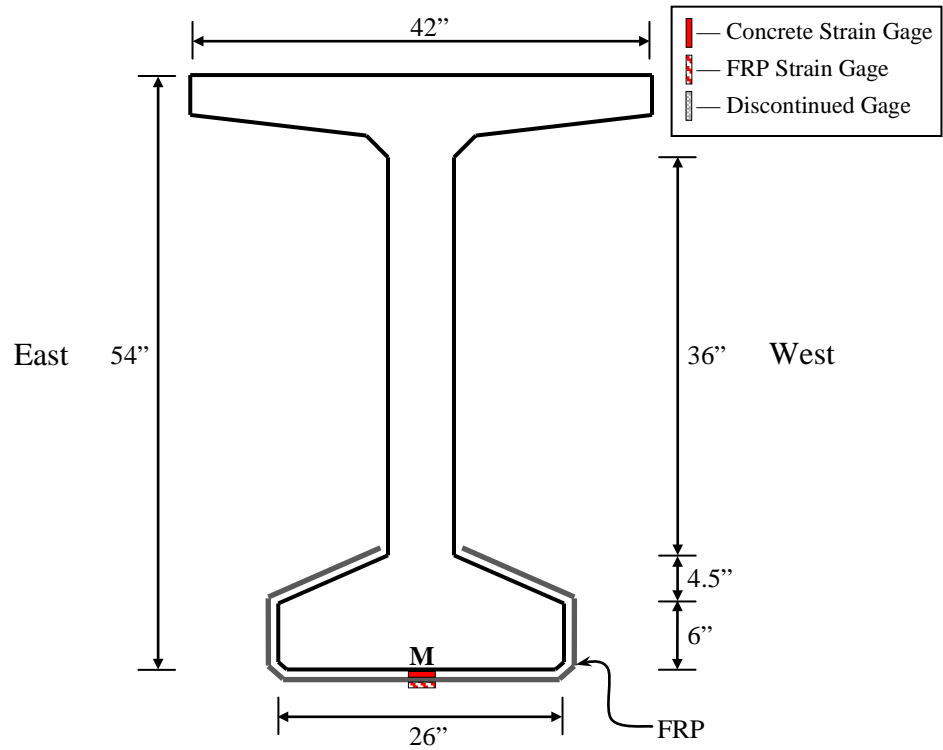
Strain gage locations—Girders 7 and 8—Section 5
